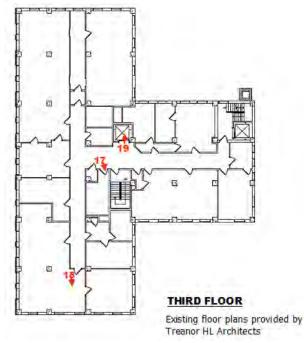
Current Floor Plans with Photo Key – Third Floor (Treanor Architects HL)
